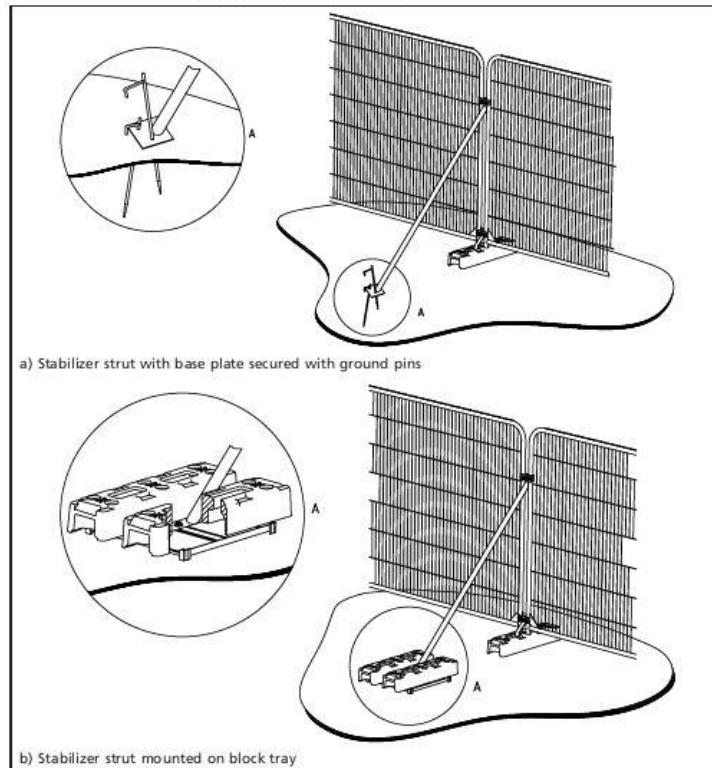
Protective fencing, ground stabilizing image: Image sourced from BS5837: Trees in relation to design, demolition and construction - Recommendations
